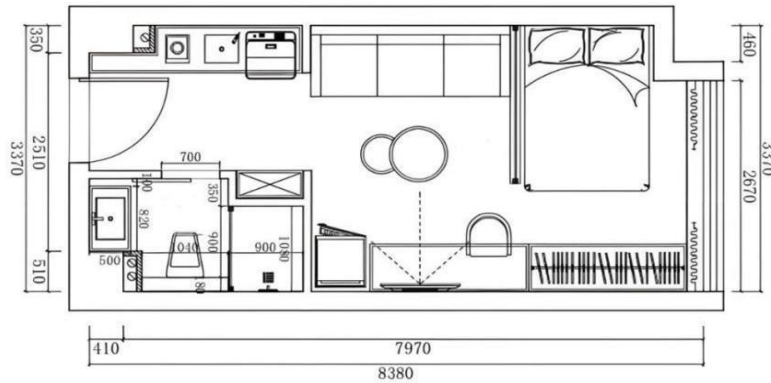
Floor plan of a 28.2 m² single-person apartment for young people
